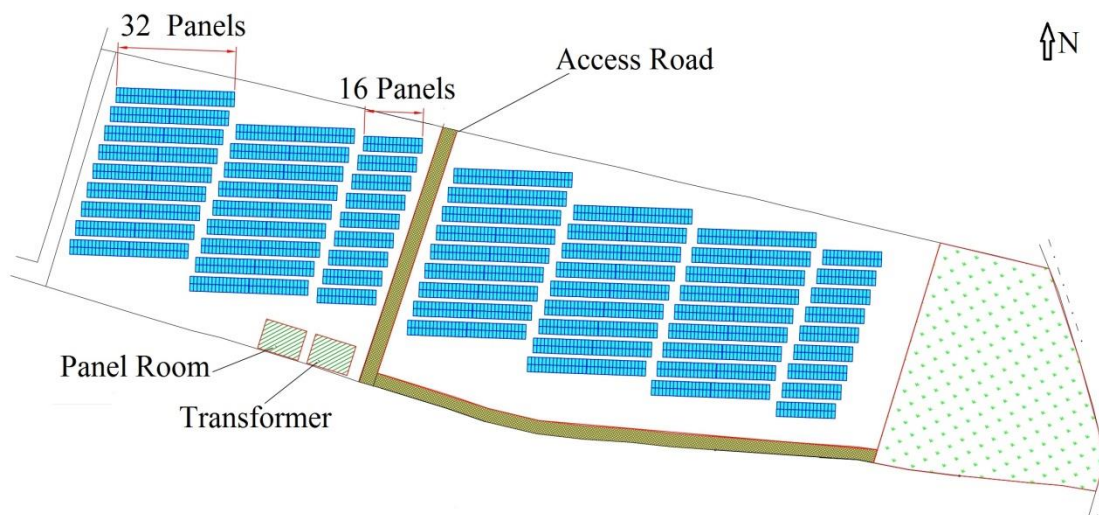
Layout plan - Beliatta ground mounted solar PV plant
